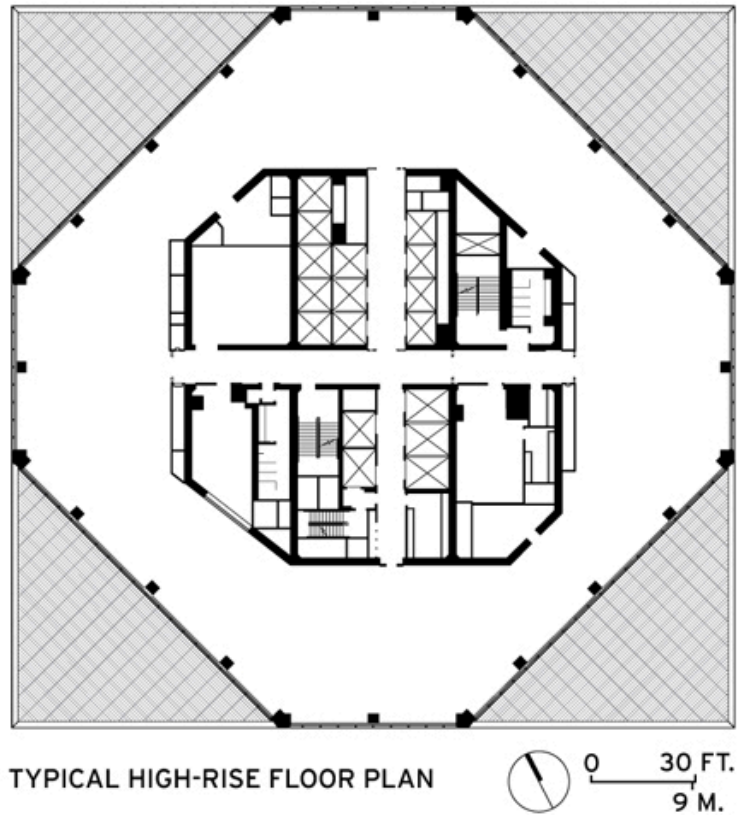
Typical High-Rise Floor Plan (OWTC:SOM, 2012)
